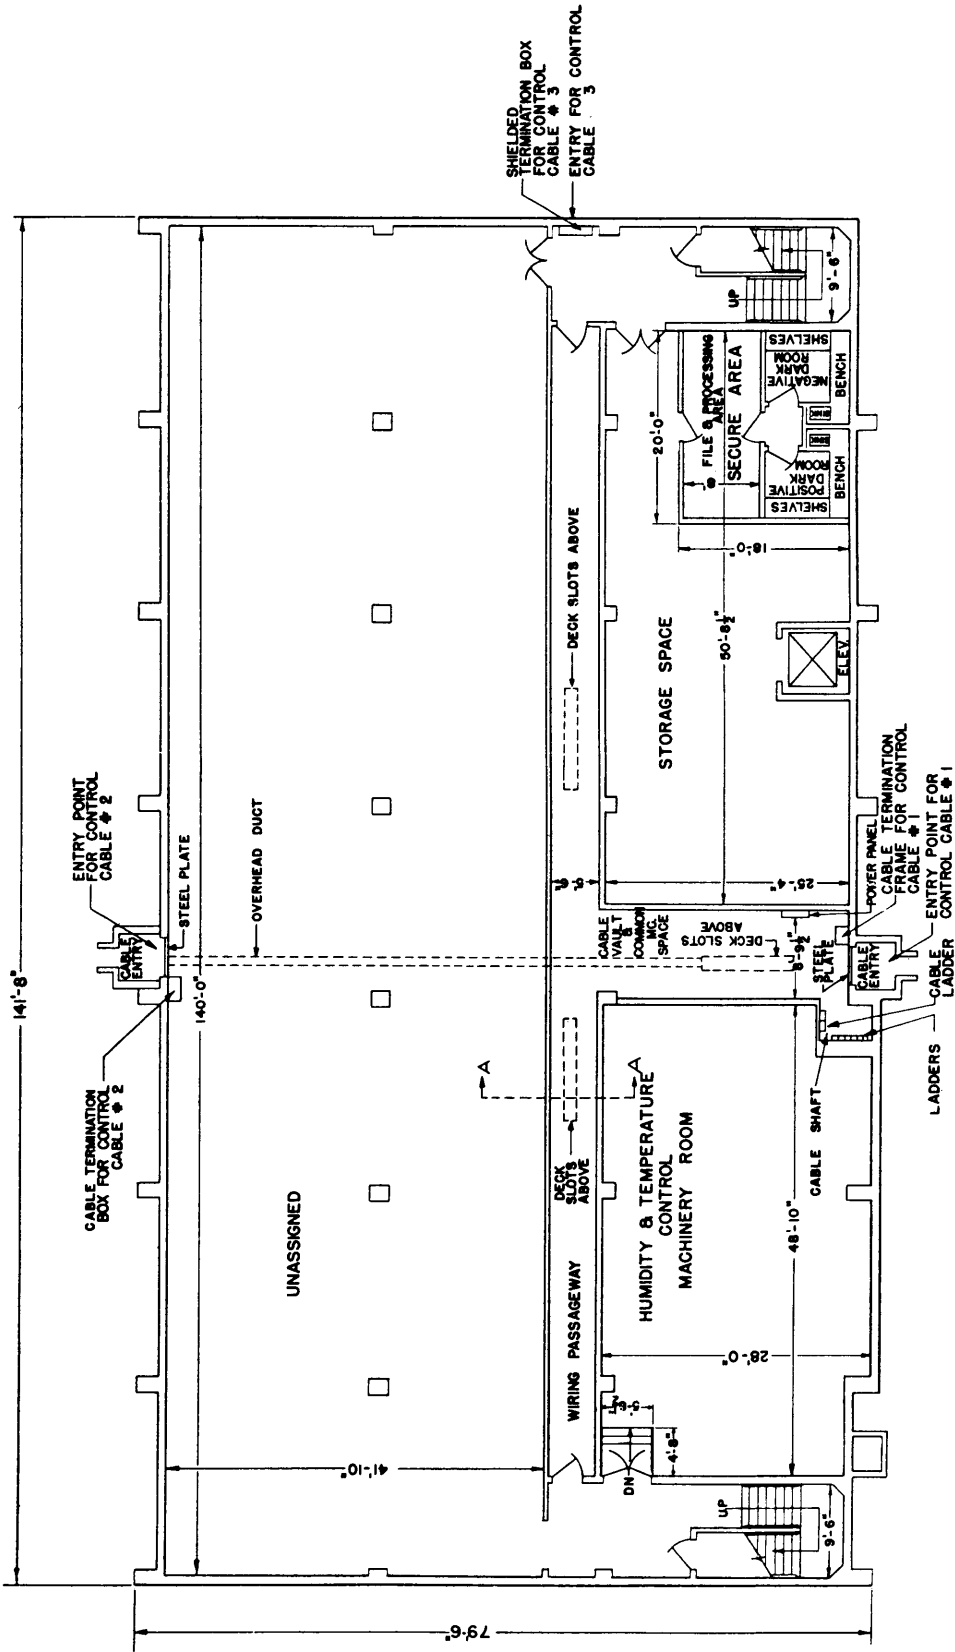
Typical Receiver Building, Basement Floor Plan
